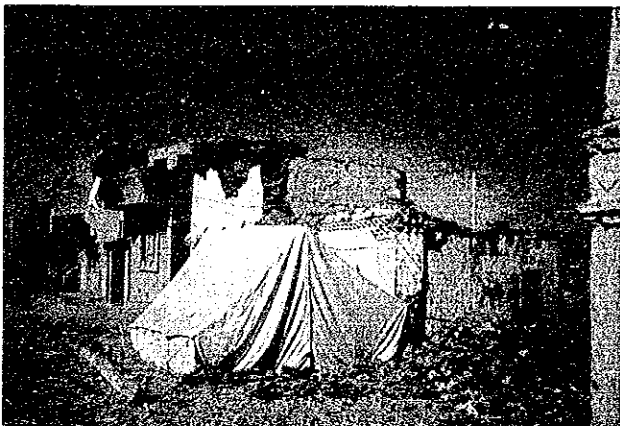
Collapsed adobe building and the relief tent (Second story which supported roof is badly damaged in most cases)
